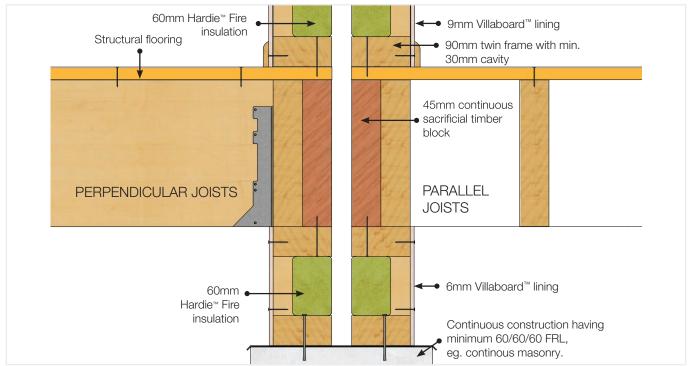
HARDIE™ SMART INTERTENANCY WALL SYSTEM WITH SUSPENDED GROUND FLOOR
